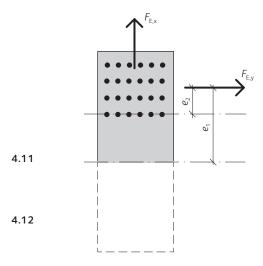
Connecting of CLT panel using steel plates. Schematic diagram. The plates can be fastened using nails or wood screws.
